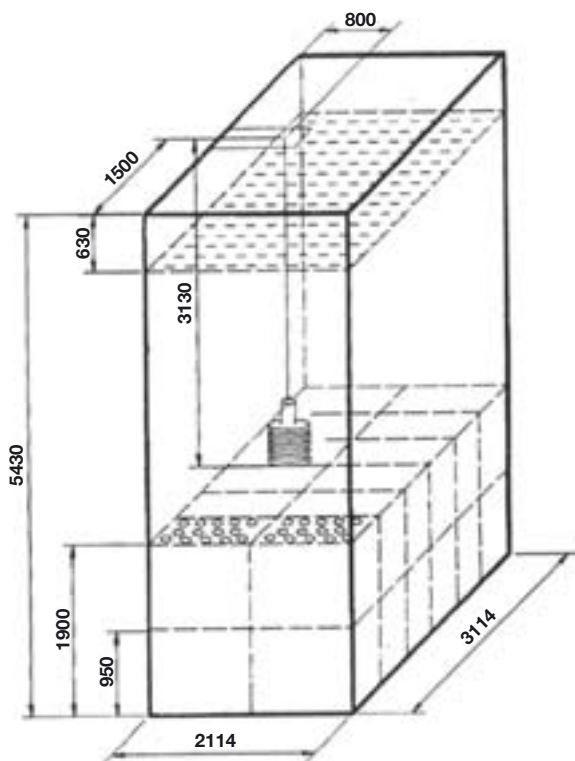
Spent fuel basin and position of rack. Dimensions in millimetres.
